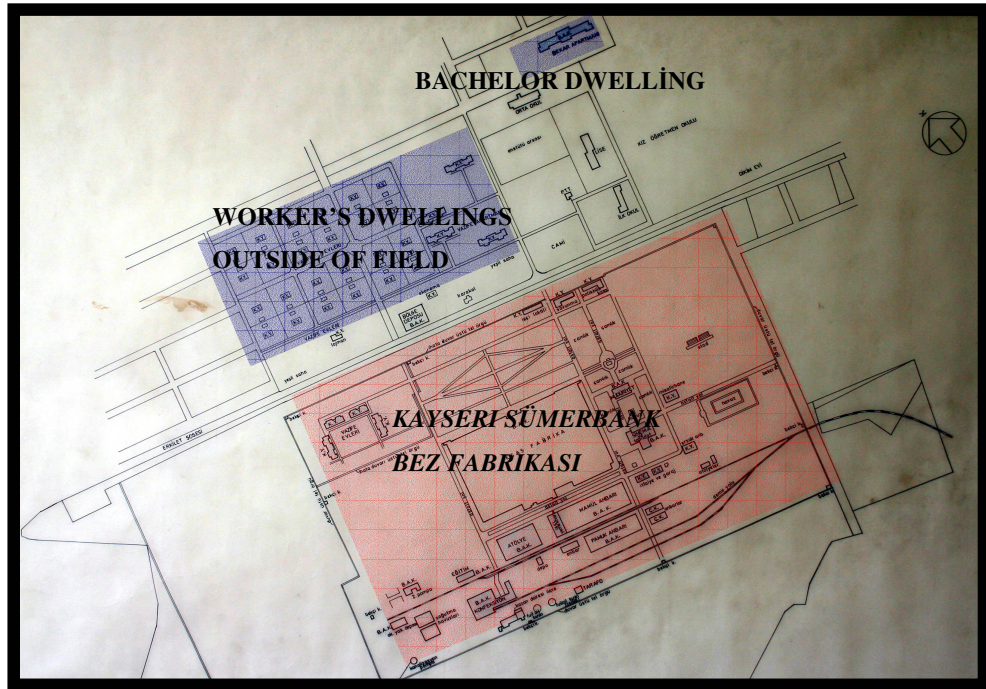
Kayseri Sümerbank Bez Fabrikası* site plan in 1935³⁹
